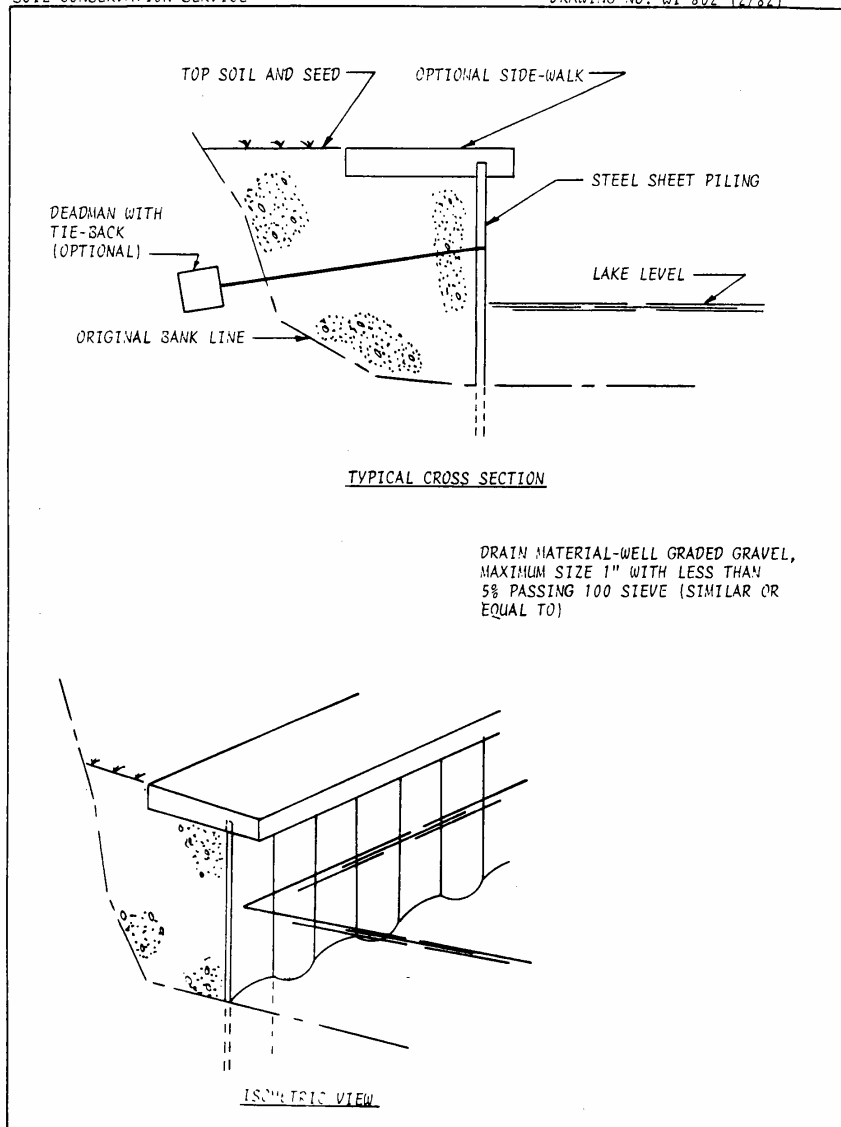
Typical drawing for lake shore protection using steel sheet piling wall.
